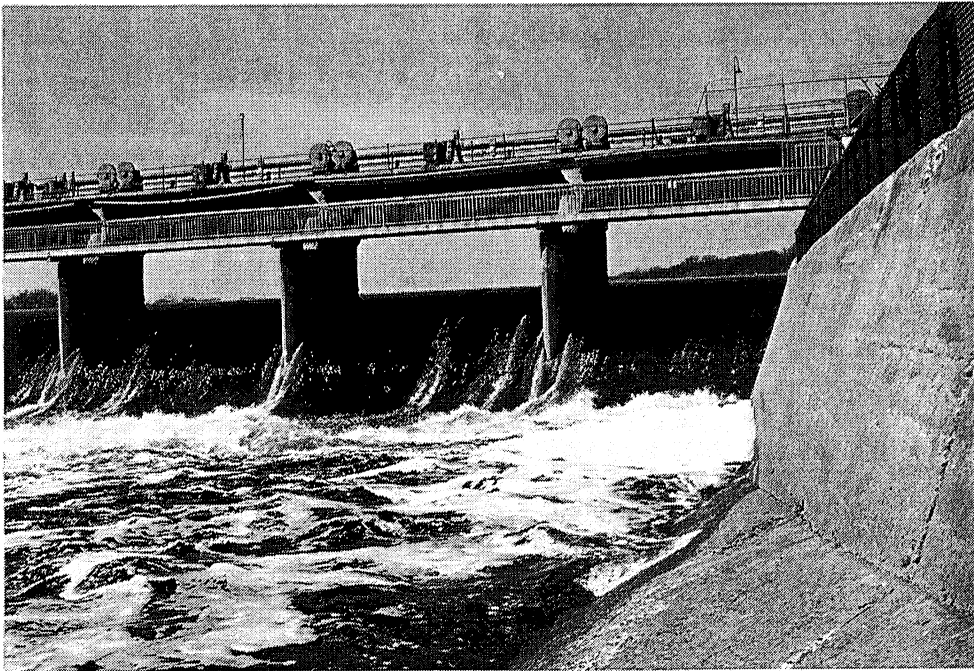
Downstream Coon Rapids Dam 12-14-89.
